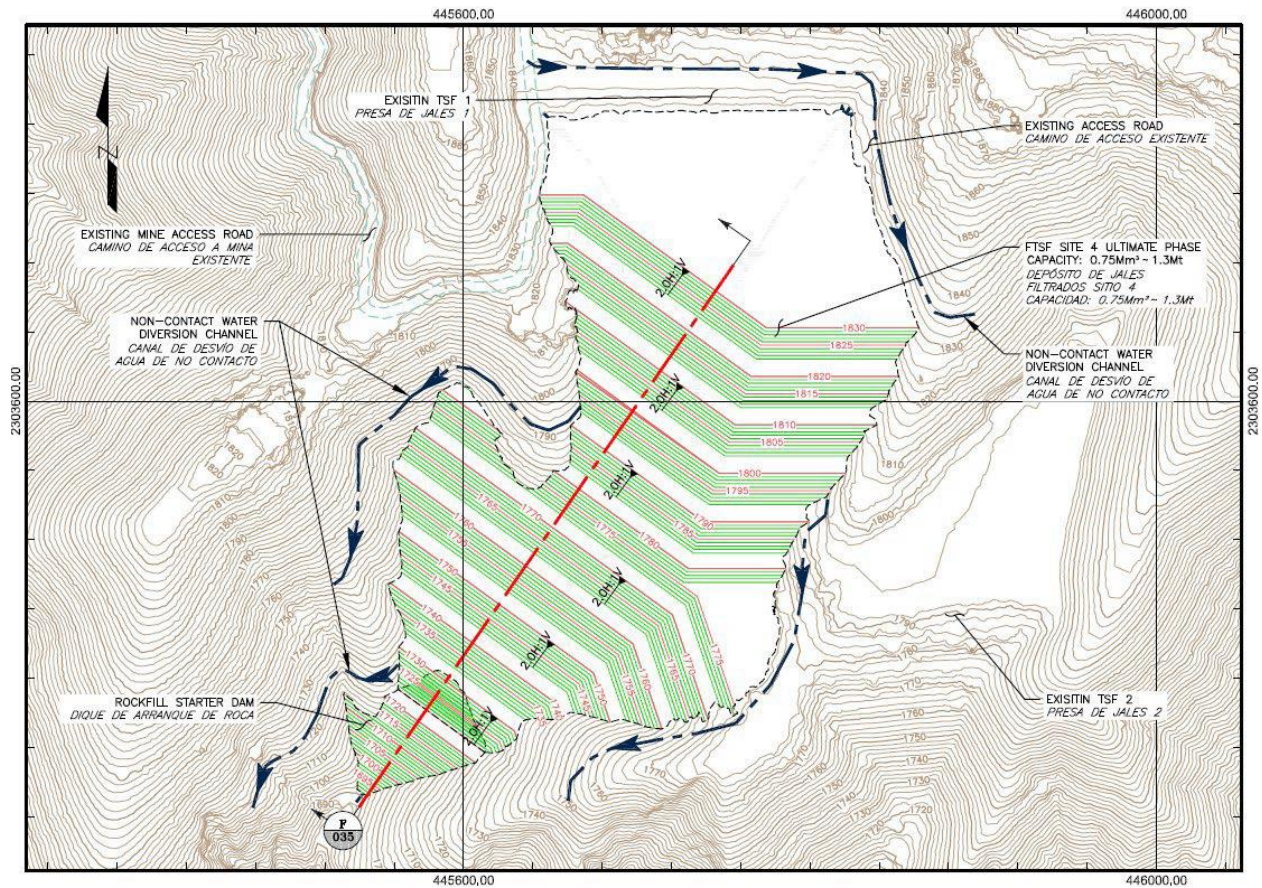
below shows the preliminary layout for the development of a potential filtered tailings storage facility at Site 4.
